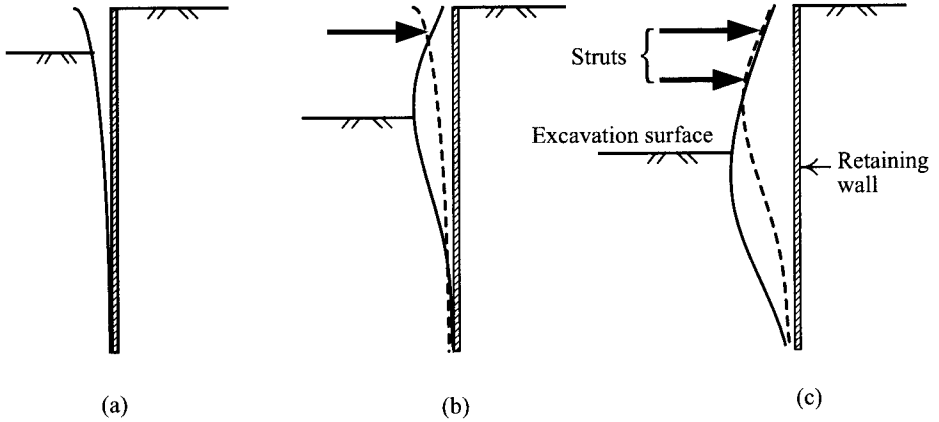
Relationship between the shape of wall deformation and high strut stiffness: (a) first stage of excavation, (b) second stage of excavation, and (c) third stage of excavation.
